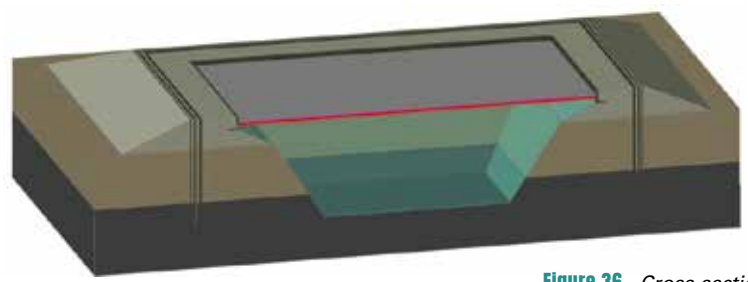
Cross-section of one possible geometry for a giga_TES storage, with diaphragm wall to cut off groundwater from the storage, elevated dam structure and floating lid (Source: Ingenieurbüro ste.p)
